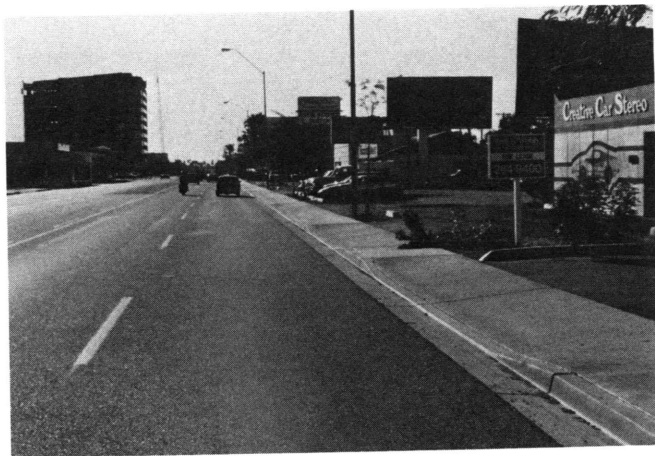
Placing sidewalks immediately adjacent to the bank of curb and allowing the owners of the adjacent properties to pave the right-of-way result in extremely poor delineation of the driveway location and geometry. A landscaped buffer in addition to the right-of-way should be required to enhance driveway identification.
